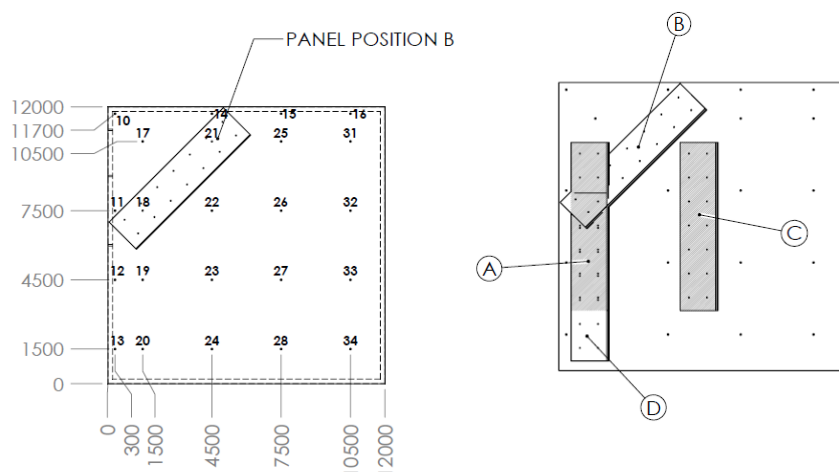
Inclined solar panels attached to a flat roof building showing pressure tap locations for Part B of project.
